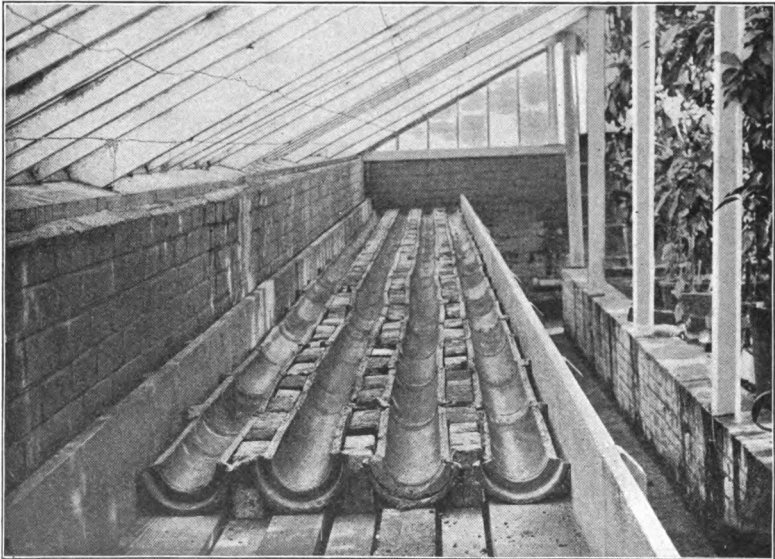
Bench built of brick and split sewer pipe for subirrigation
